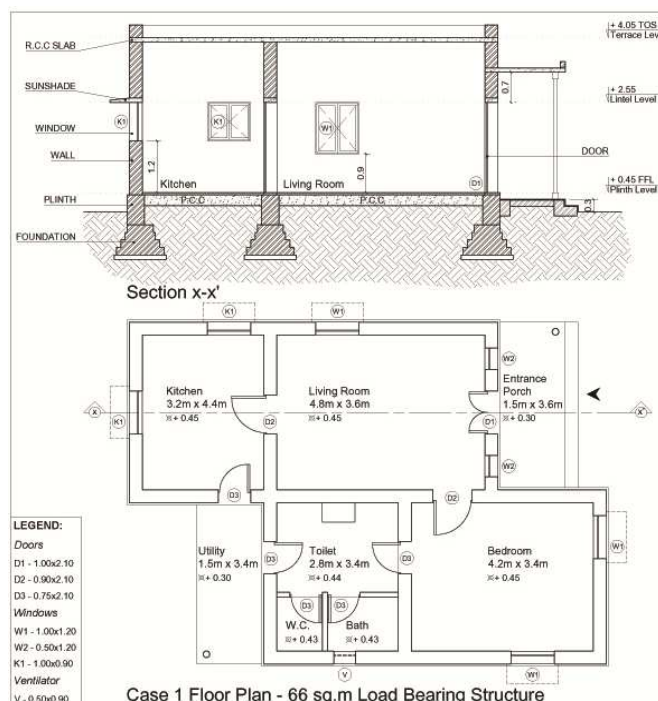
Residential Building Typology 1 – Load Bearing Structure
